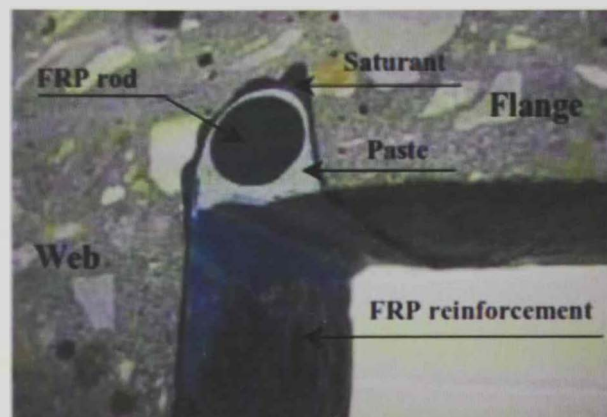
Details of the U-Anchor at the corner of flange-web (Khalifa et al. 2000)
